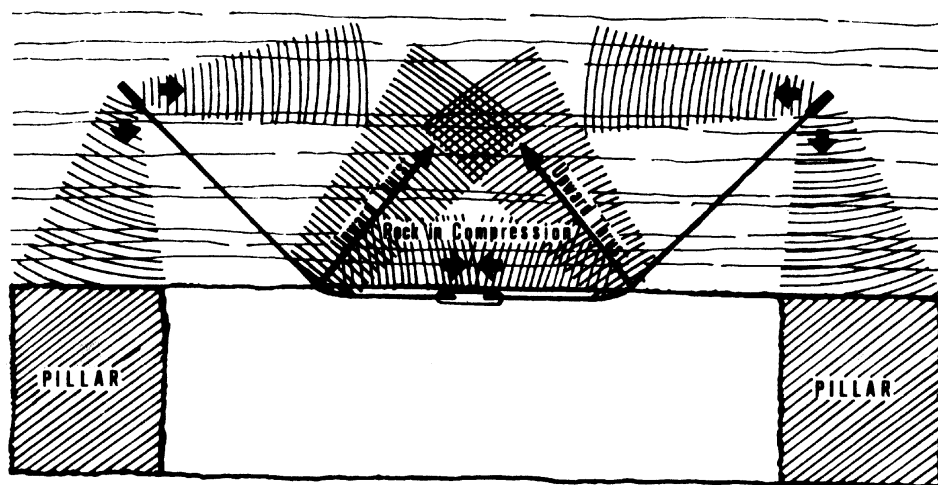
Compression zone created by trusses (Khair, 1983)
